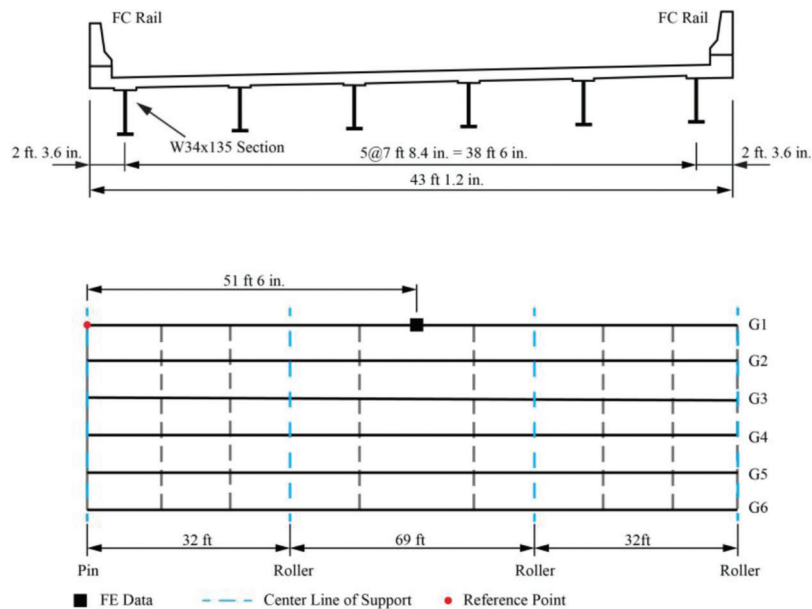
Cross-section and frame plan of the modified three-span continuous steel girder bridge.
